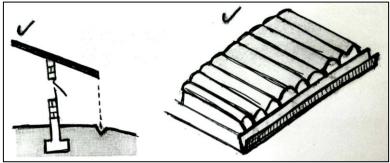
45: PVC pipe rainwater gutter Source: Safety Shelter Handbook
